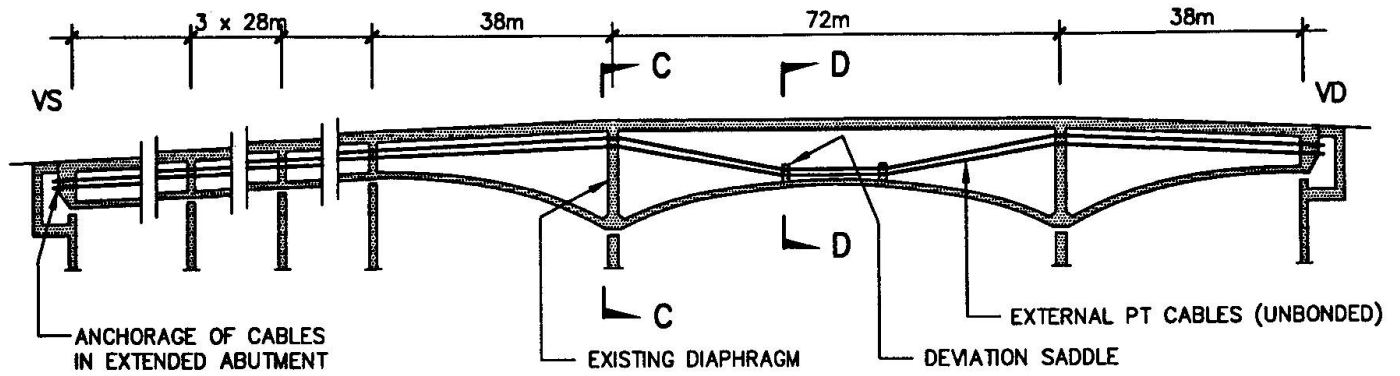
MASSONGEX BRIDGE : CABLE LAYOUT OF ADDED EXTERNAL POST TENSIONING
